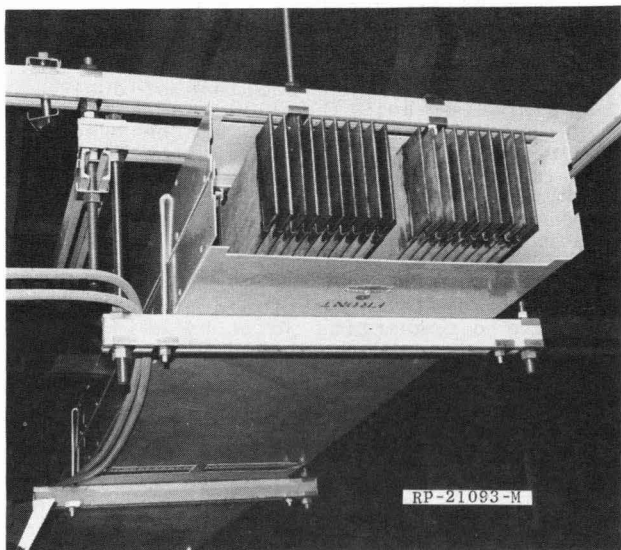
HORIZONTAL SECTION OF DUCT MOUNTED IN PLACE
